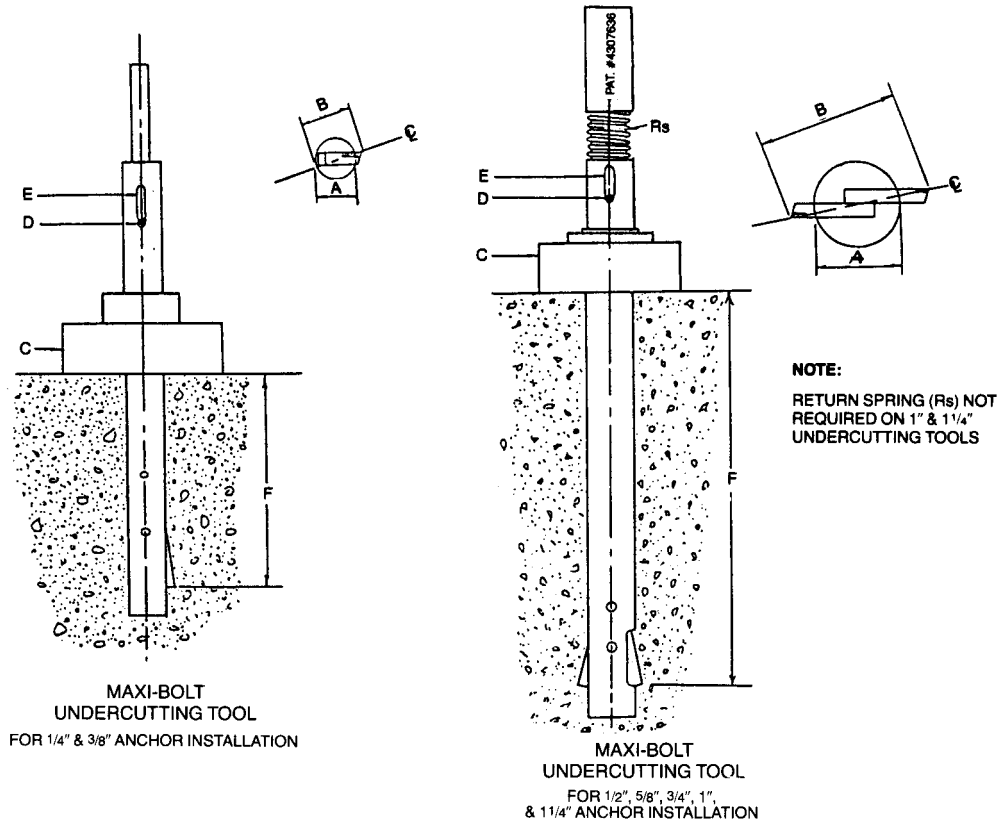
ANCHOR INSTALLATION DETAILS
